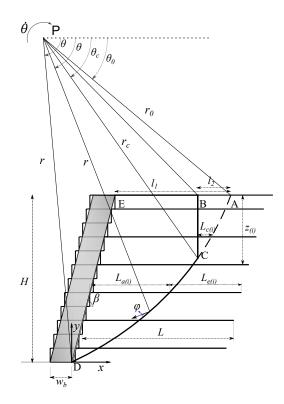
Rotational failure mechanism in a reinforced soil wall with a vertical crack and notations. Two types of wall facing considered: modular block facing and full-height rigid facing (in grey).
